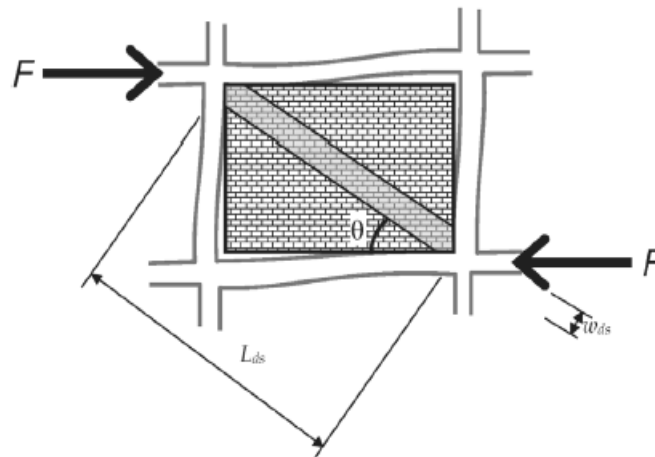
Equivalent diagonal strut of URM infill wall [14]
